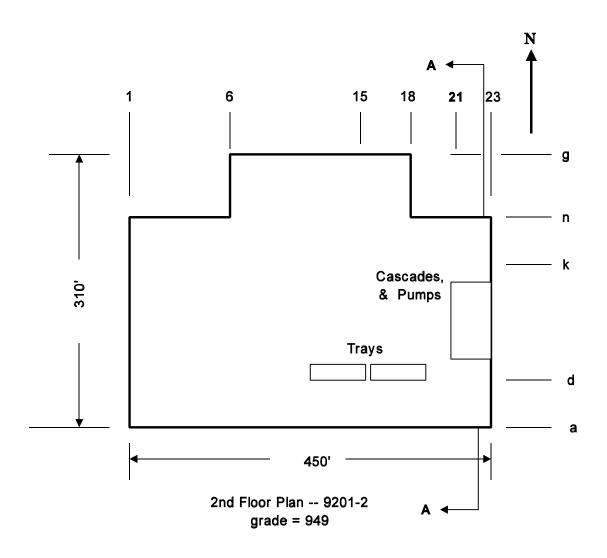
is a 2nd floor plan and a sectional elevation of Building 9201-2. It is provided here to show the location of the Colex Pilot Plant that existed there in the early 1950's. As shown in Figure 1, two absorber trays were located along column line d between column lines 15 and 20. Floor area occupied by this equipment was approximately 20 x 90 feet, or 1800 ft<sup>2</sup>. These two trays are shown on drawing E-HV-20238. A third tray was documented in an Industrial Hygiene air sampling report dated 12/19/54. I assume it was in the same vicinity and occupied about 1200 ft<sup>2</sup>. Other components of the Colex Pilot Plant, consisting of columns, pumps, etc., were installed along the east end of the building between column lines d and k. They occupied a floor area of approximately 4000 ft<sup>2</sup> on three floors. The total building volume that was occupied by the Colex Pilot Plant is estimated to be 525,000 ft<sup>3</sup>.
